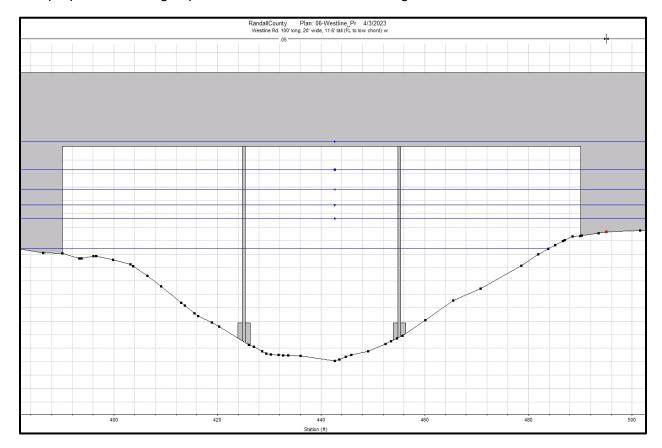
Proposed 1% LOS upstream cross section at Westline Road crossing of Palo Duro Creek.
